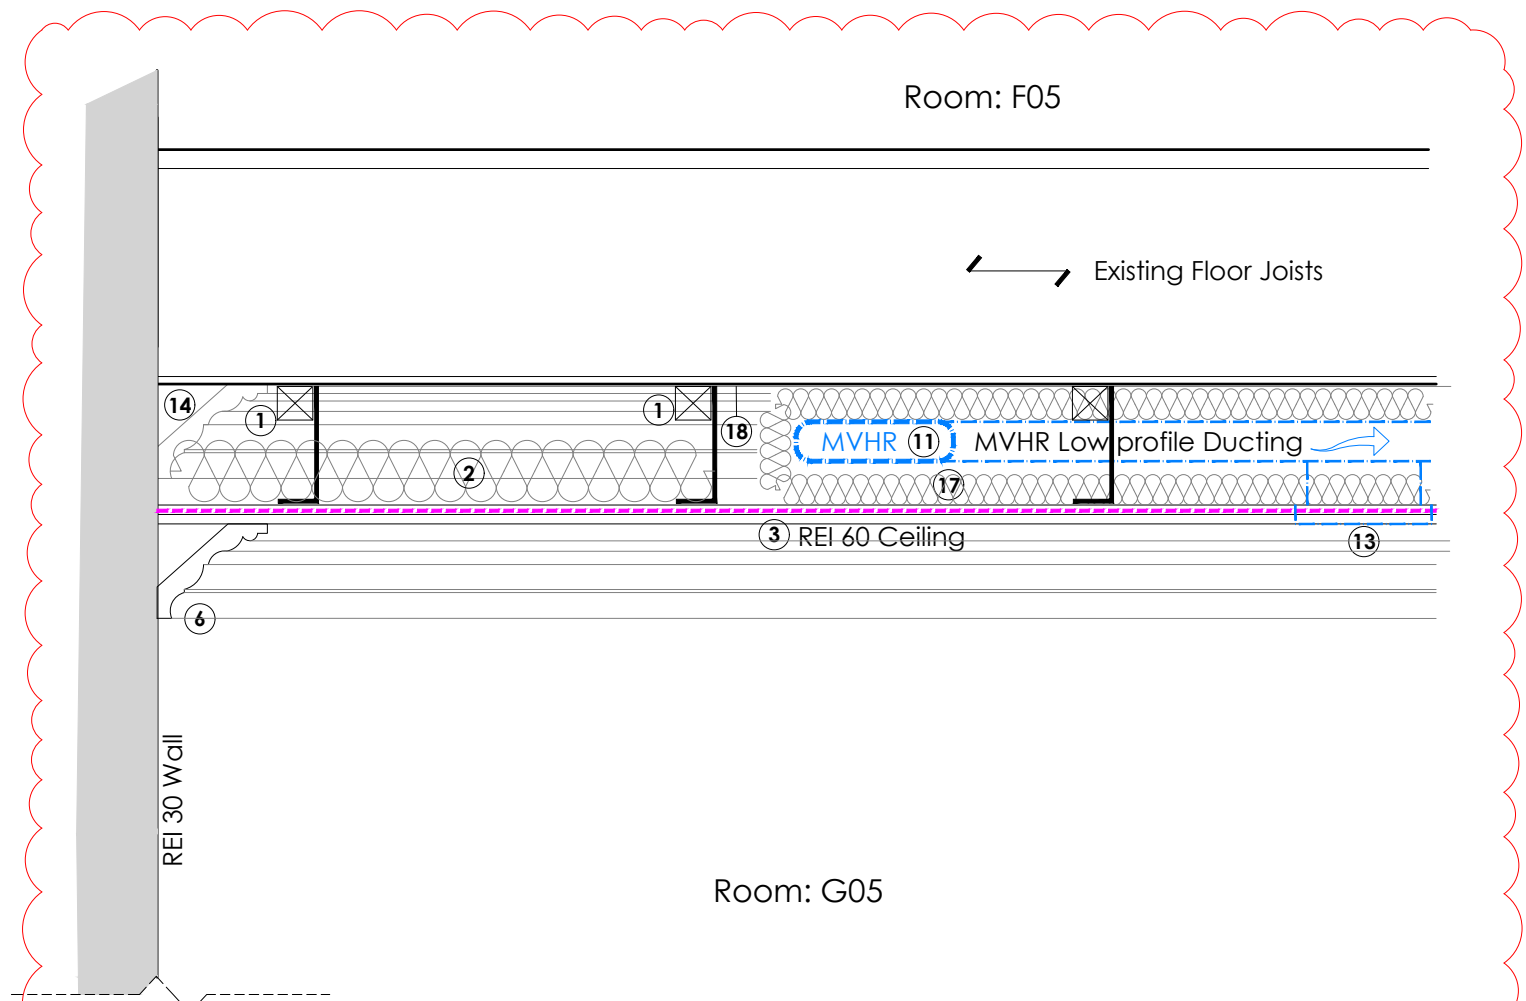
New Lobby Floor and Internal Walls - scale 1:10
